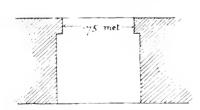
Plan of a Doorway with Rebated Jambs.
